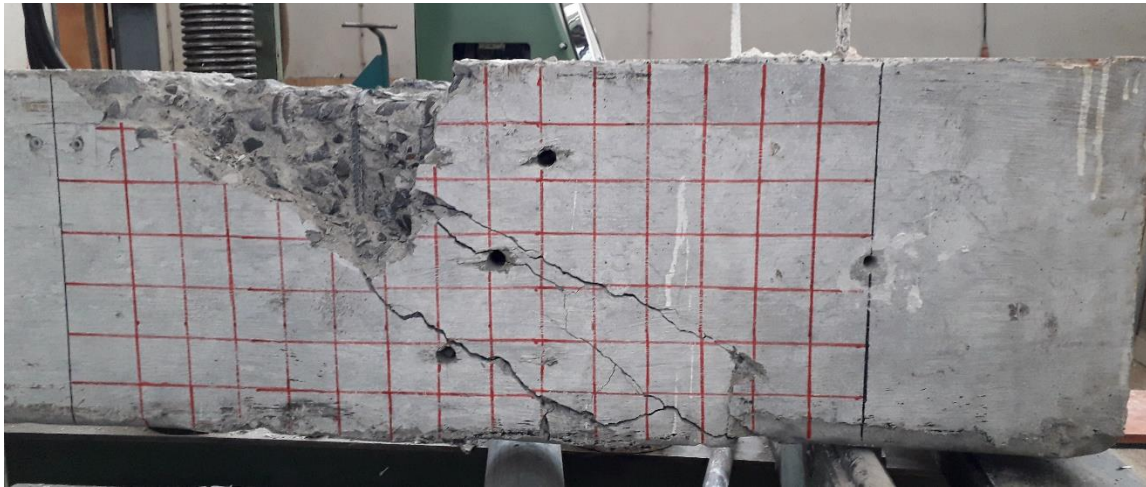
Diagonal Compression Crack at Failure (SI8-50)
